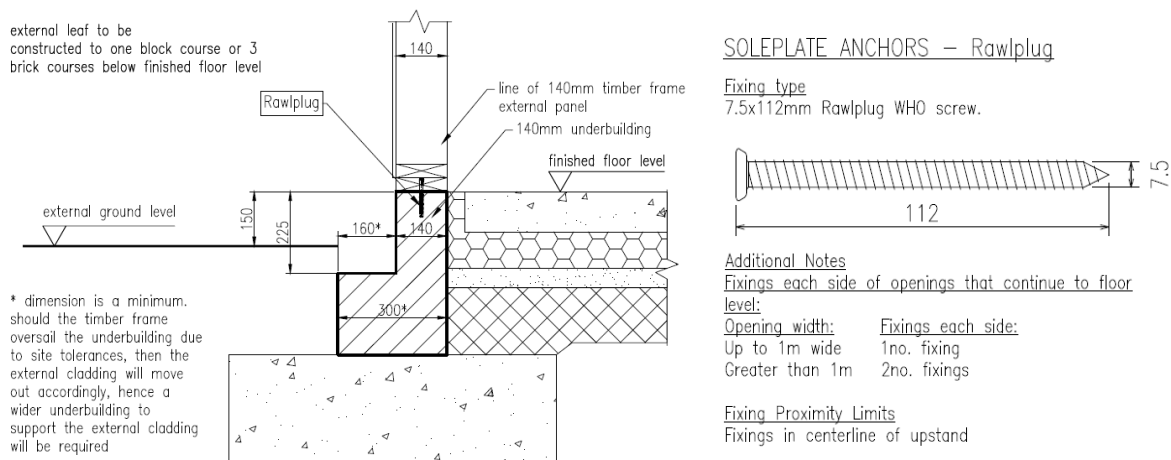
Exterior Wall foundation detail with sole plate (left), soleplate anchor (right) (Cygnum)
